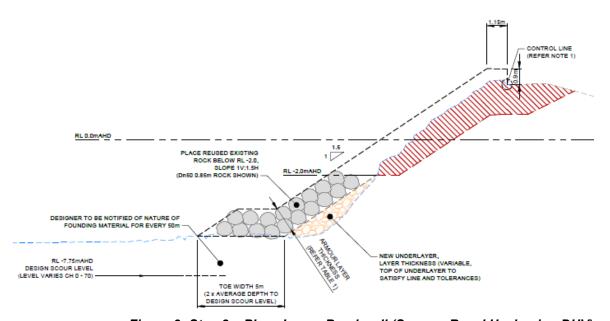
Step 2 – Place Lower Breakwall (Source: Royal Haskoning DHV)
